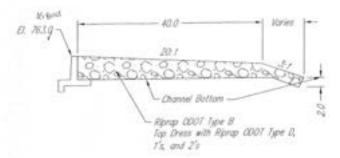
Blanchard River – Existing Inline Structure - (profile View)
